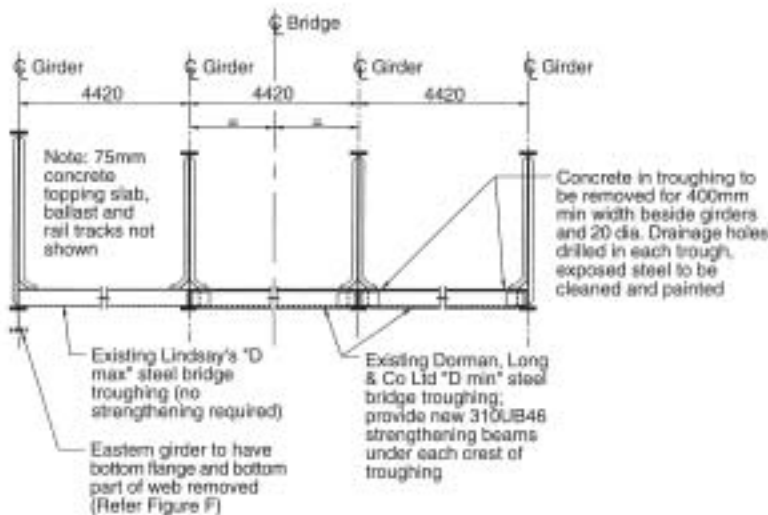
Figure D GLENELG RIVER BRIDGE CROSS-SECTION
